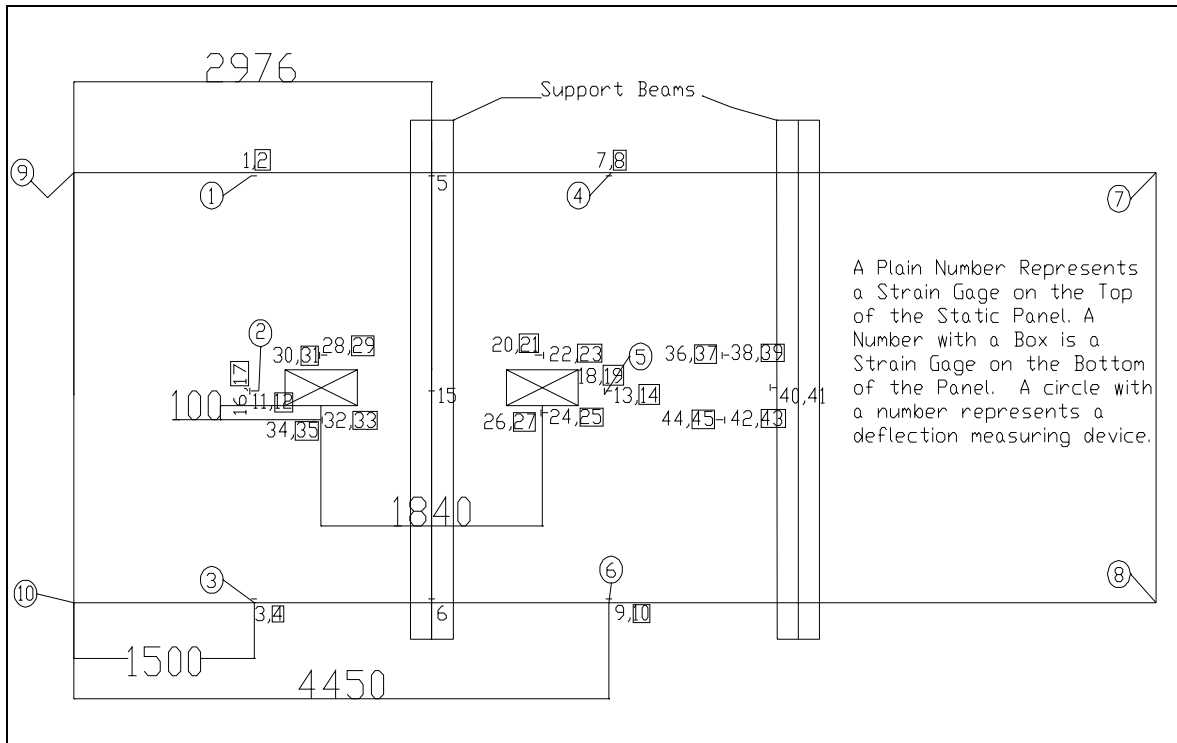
LOAD POSITION AND INSTRUMENTATION LAYOUT FOR TEST P1-A
